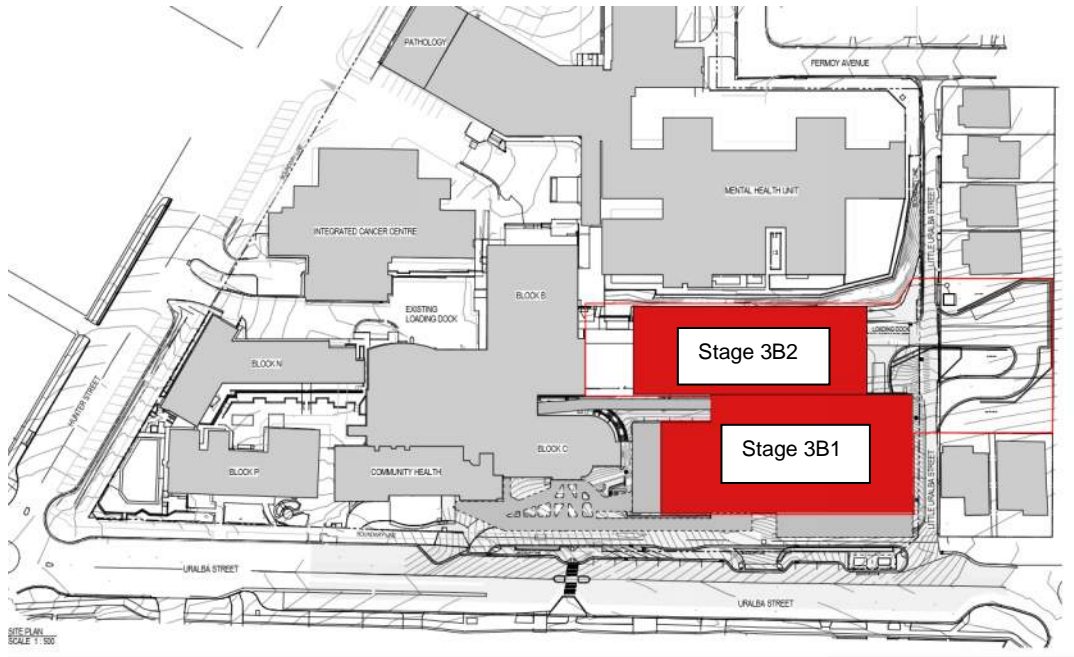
Site Plan showing the specific location of the north tower Stage 3B2 (Woods Bagot Drawing No. DA1000)
